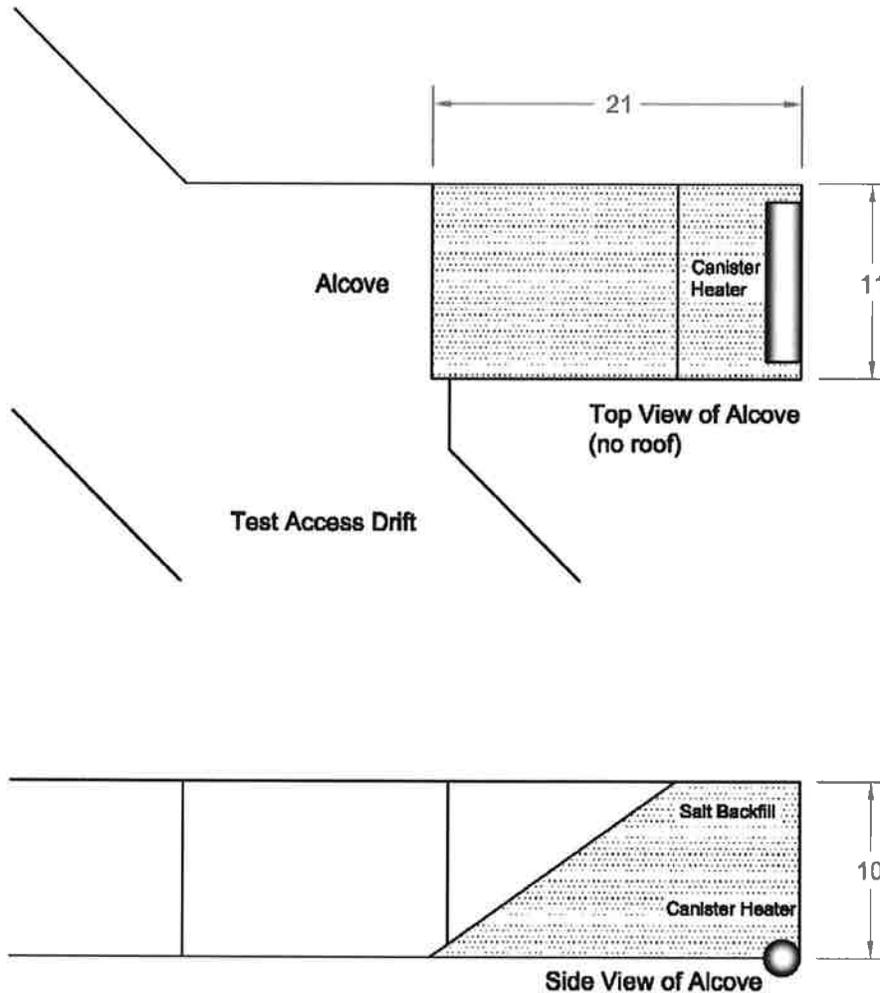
Plan View of the Mining Layout for the SDI In Situ Test
